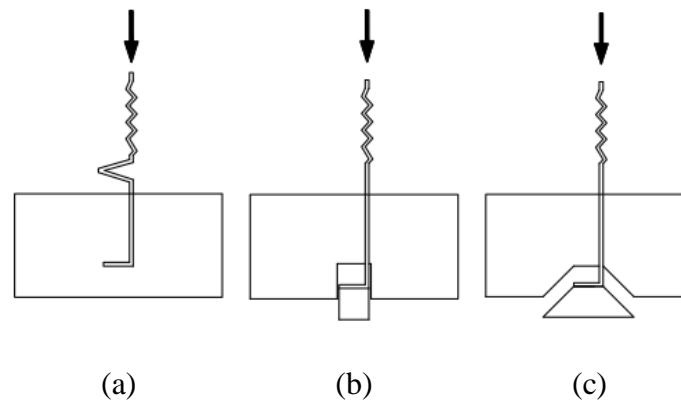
Failure modes in Compression of a cavity wall tie connection: Buckling (a), Piercing (b) and Punching (c).
